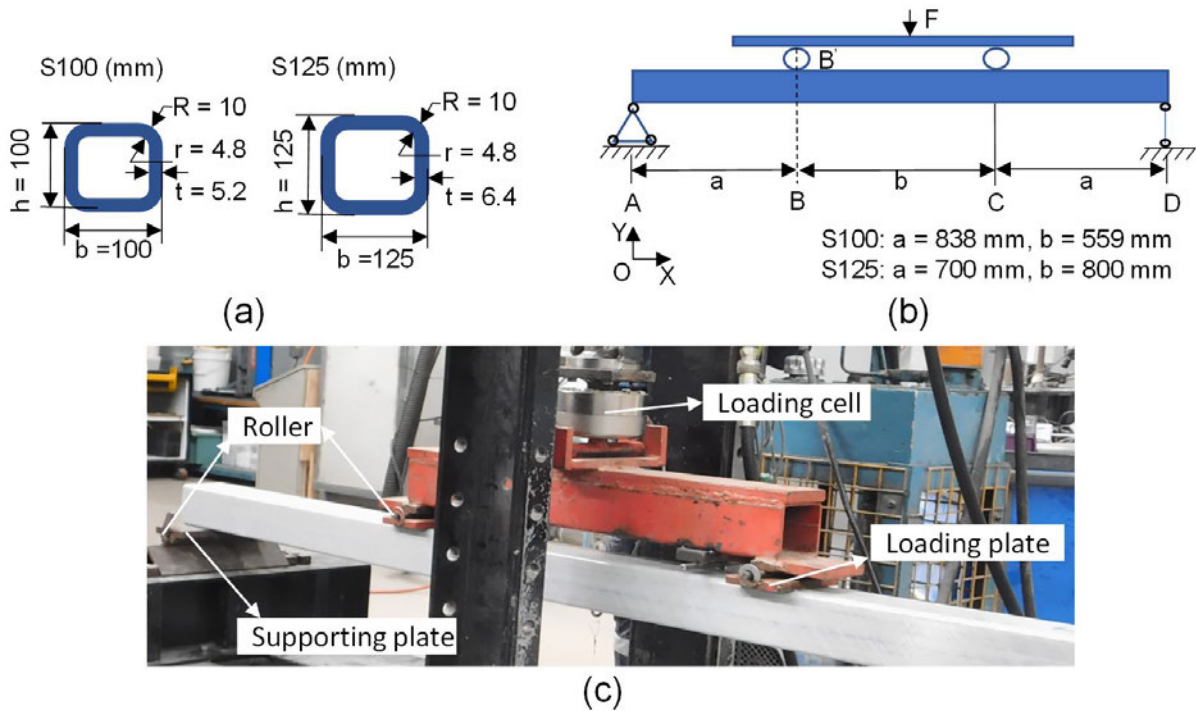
Flexural test setup; (a) cross-sectional dimensions of S100 and S125, (b) dimensions of four-point bending test for different profiles and (c) four-point bending test configuration.
